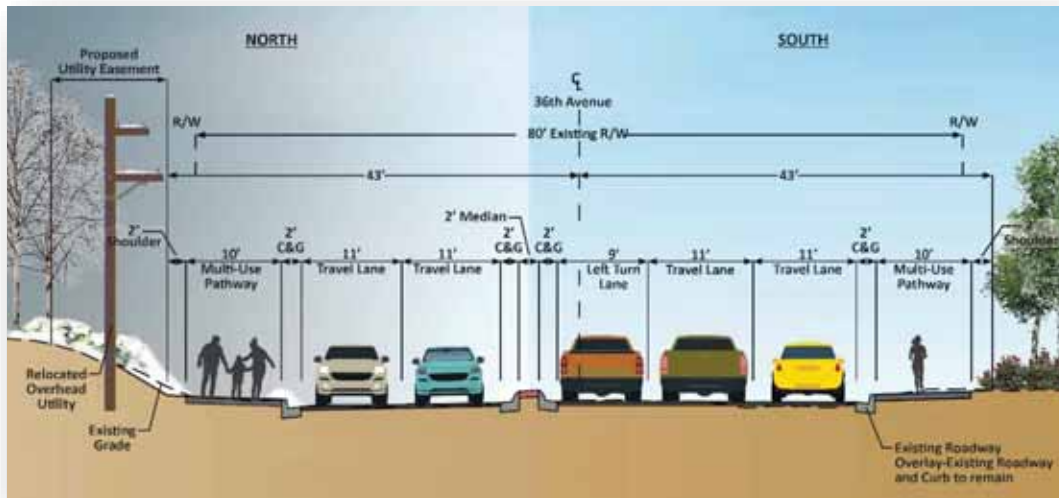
36th Avenue (A Street to Old Seward Highway) – Alternative 1
